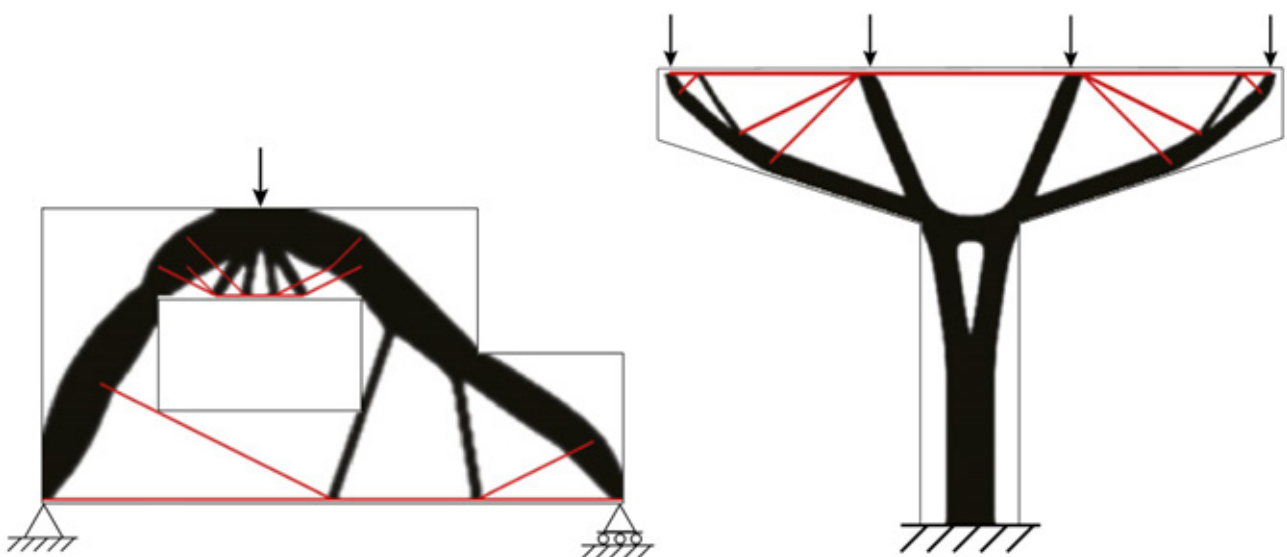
Optimised strut-continuum designs. Red: tension loaded strut elements, black: compression loaded concrete
